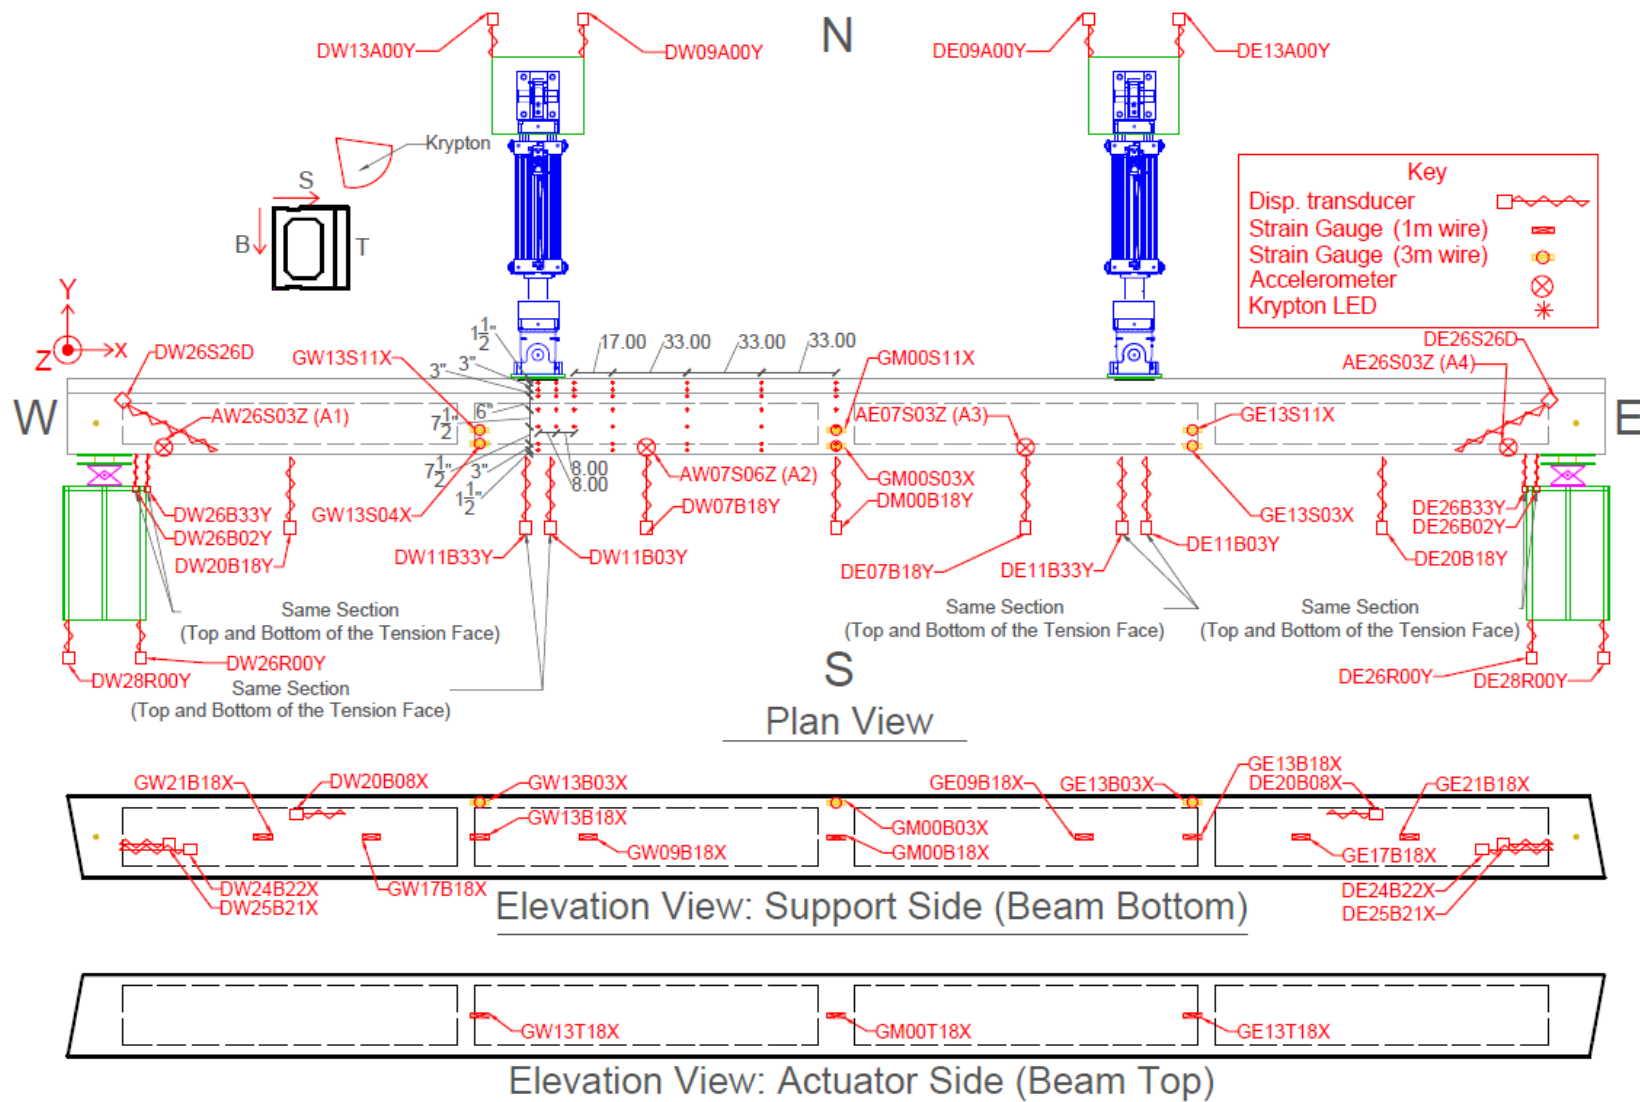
Beam 2 Instrumentation (capacity-level tests)
